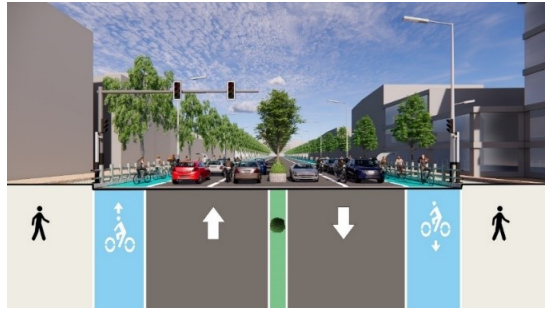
Perspective sectional view of 30m wide road (South side, Section at BB)
